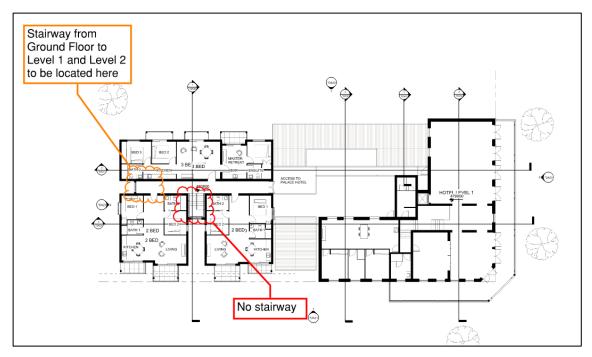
Floor Plan – Proposed Level 2 (Amended by Council 19 August 2024)
